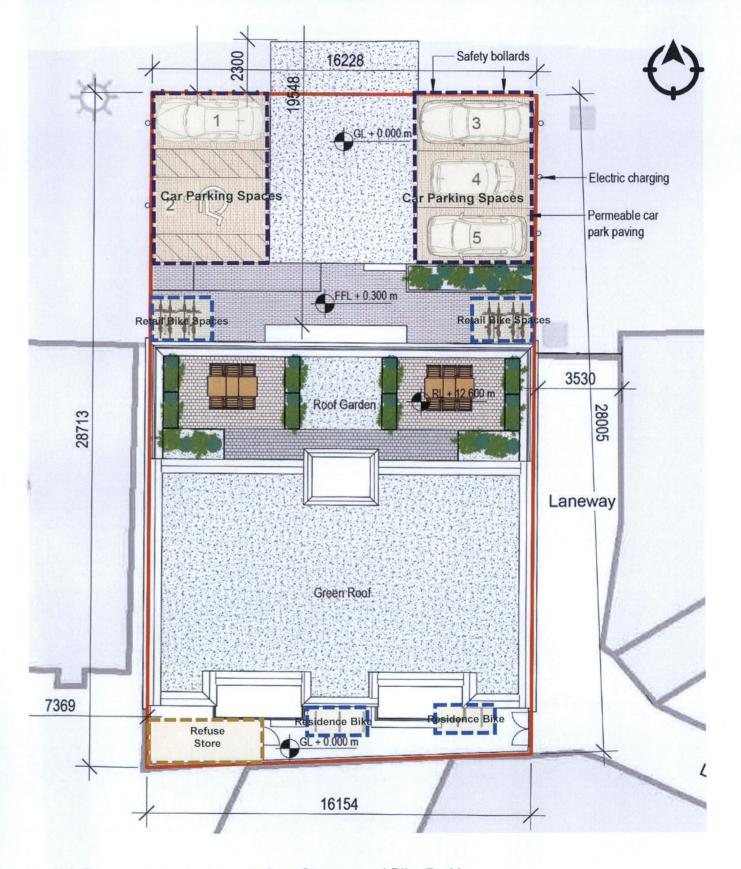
Proposed Car Parking, Refuse Storage and Bike Parking
